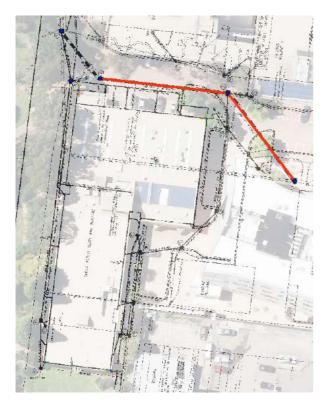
Drainage plan overlaid over aerial photography. Pipes (red lines) and pits (blue points) are digitised by tracing over the plan (WCC, 2013)
